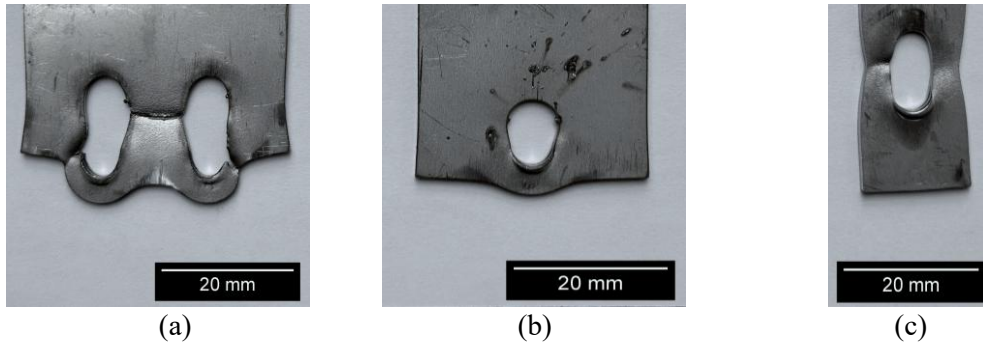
Failure modes of double-lap shear bolted connections: (a) block tearing, (b) edge bearing/shear-out, and (c) net-section tension.
